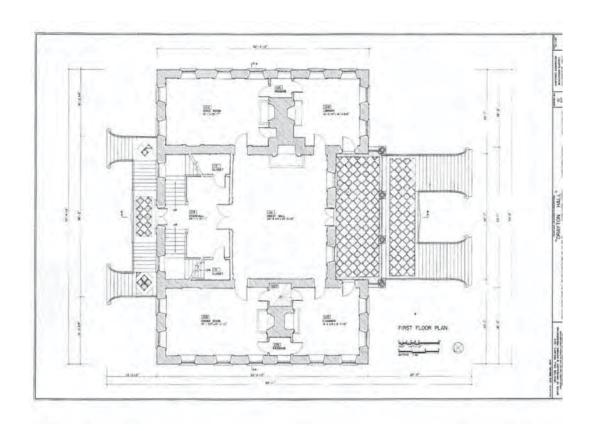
First Floor Plan, Drayton Hall, HABS SC- 377 (1973)
